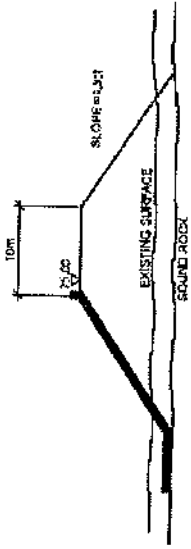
indicates the cross-sections of the water retaining structures adjacent to the power station and on the retaining embankments.
